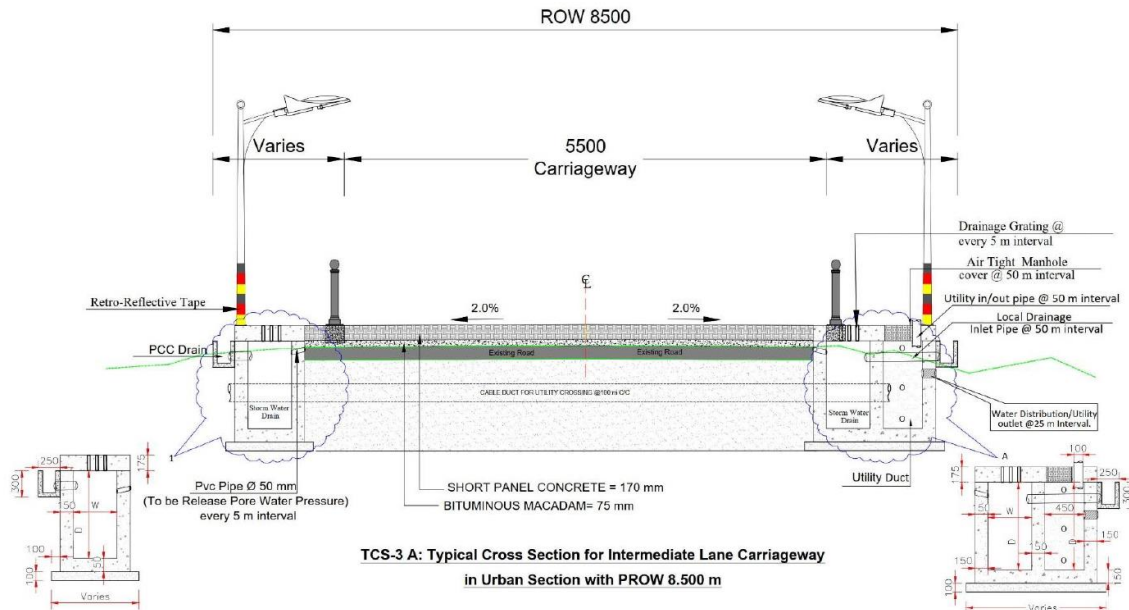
typical cross-section for SH/MDR/ODR roads - Short Panel Concrete pavement
